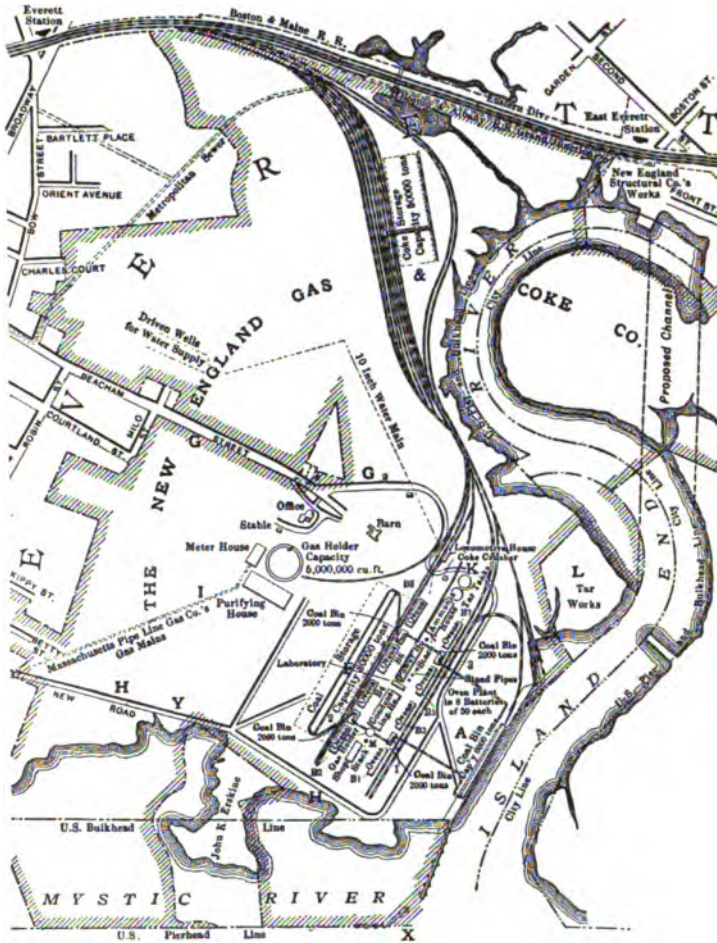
PLAN OF WORKS, NEW ENGLAND GAS AND COKE COMPANY
